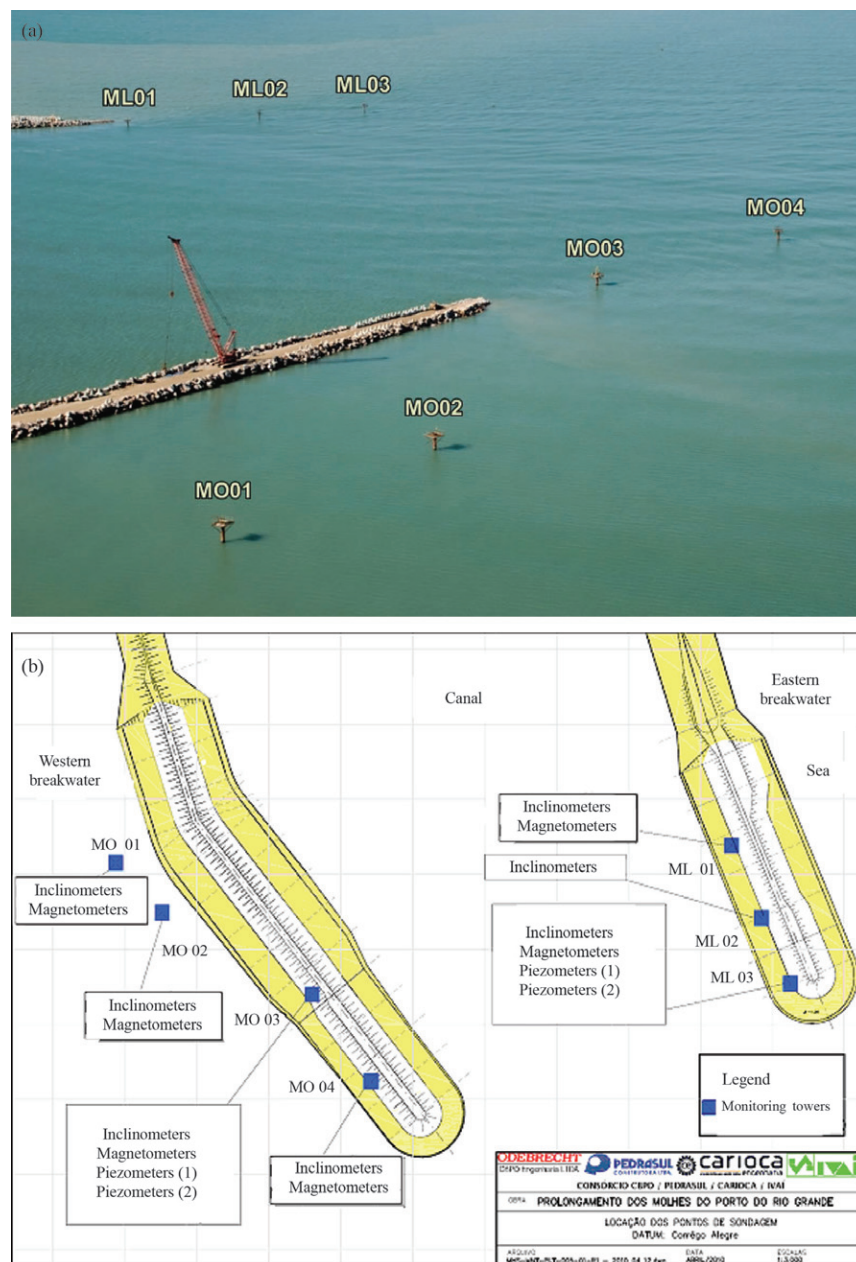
Location of instrumented sections (a) aerial photograph and (b) plan view.
